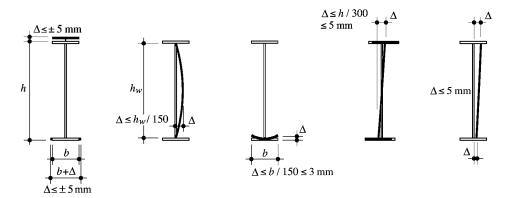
Examples of fabrication tolerances for the cross section of a plate girder.
